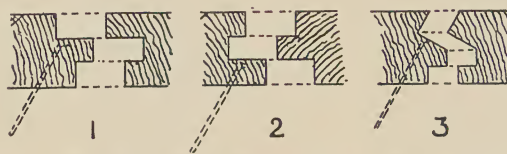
Sections of “Secret-nailed” Wood-blocks.
